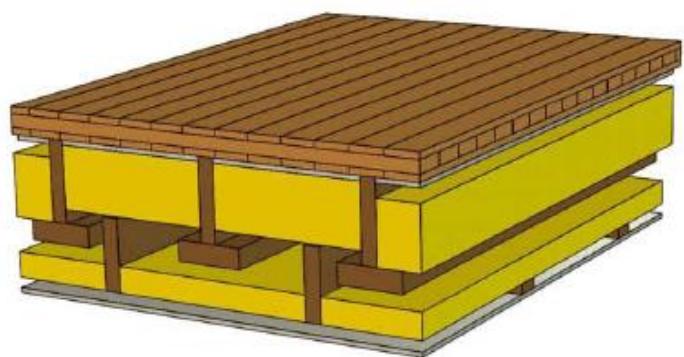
Limnologen floor-ceiling detail (Serrano, 2009).
